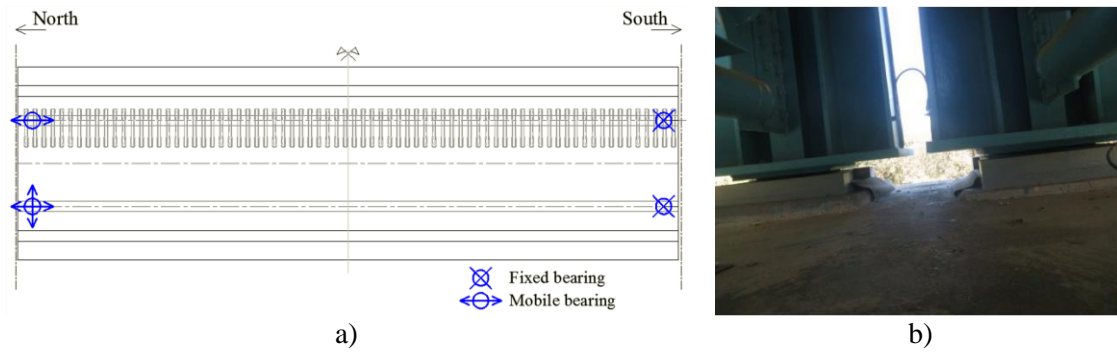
Bearings system: a) schematic representation; b) generic view of the bearings
